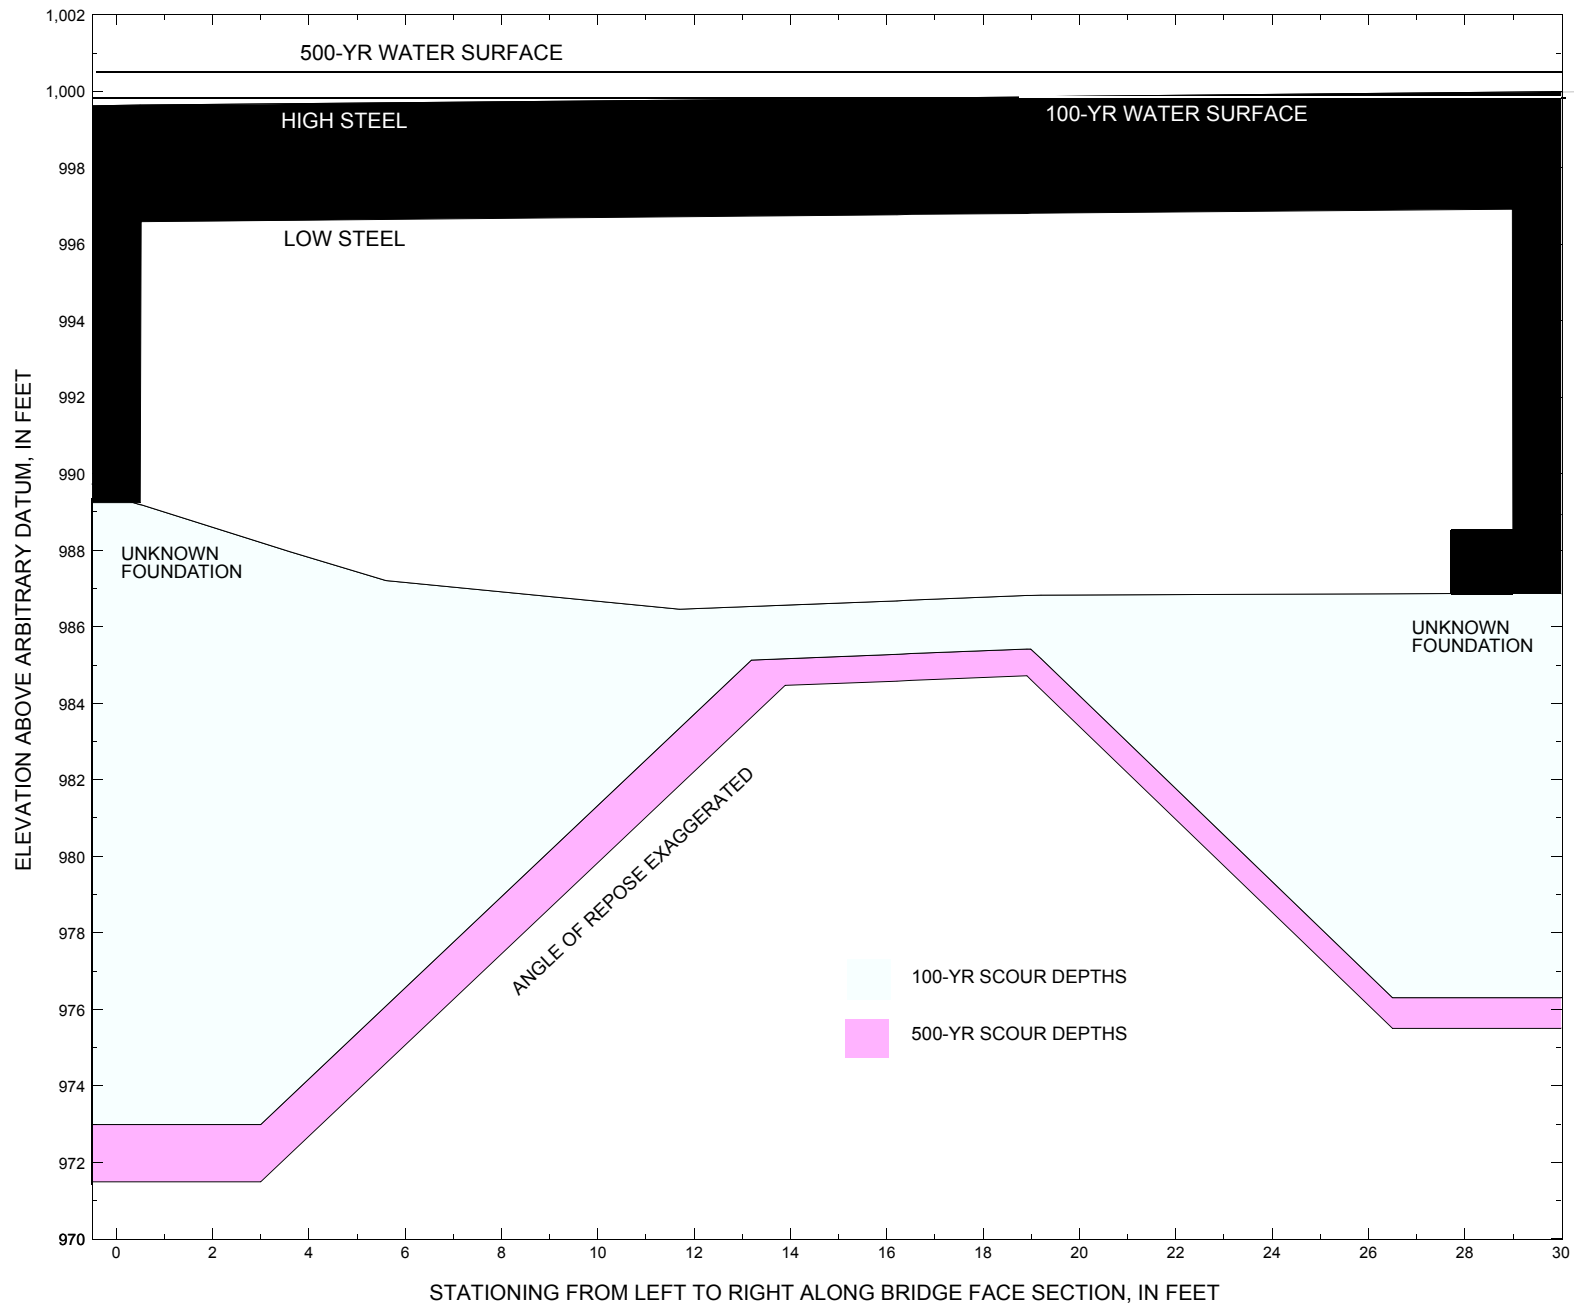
Scour elevations for the 100-yr and 500-yr discharges at structure [BRIDTH00440028](#) on town highway 44, crossing [Plymouth Brook, Bridgewater, Vermont](#).
